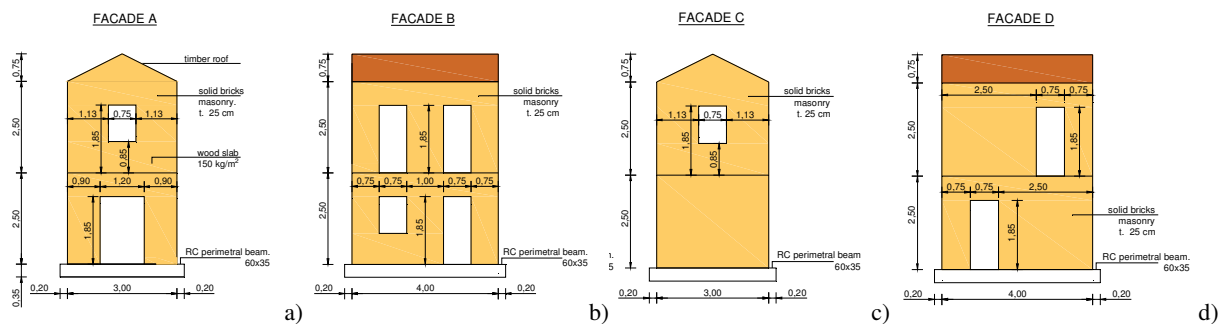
Design drawings of the specimen facades: a) facade A; b) facade B, c) facade C, d) facade D.
